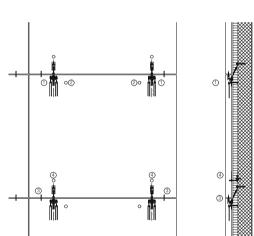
Cladding panel fixing system: elevation (above) and section (right)
